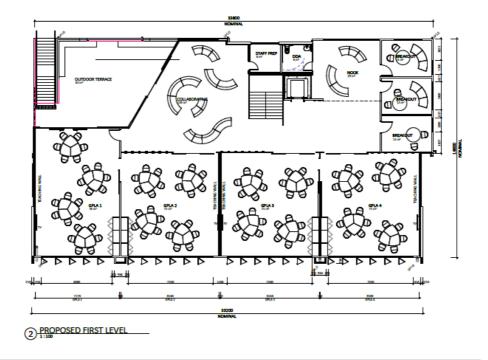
Proposed Floor Plan Courtesy of Crosier Scott Architects 03_Architectural Drawings
